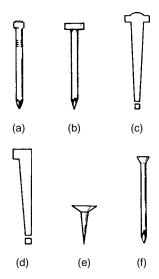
Types of nails: (a) Oval brad; (b) Wire nail; (c) Cut clasp nail; (d) Floor brad; (e) Clout nail; (f) Masonry pin
